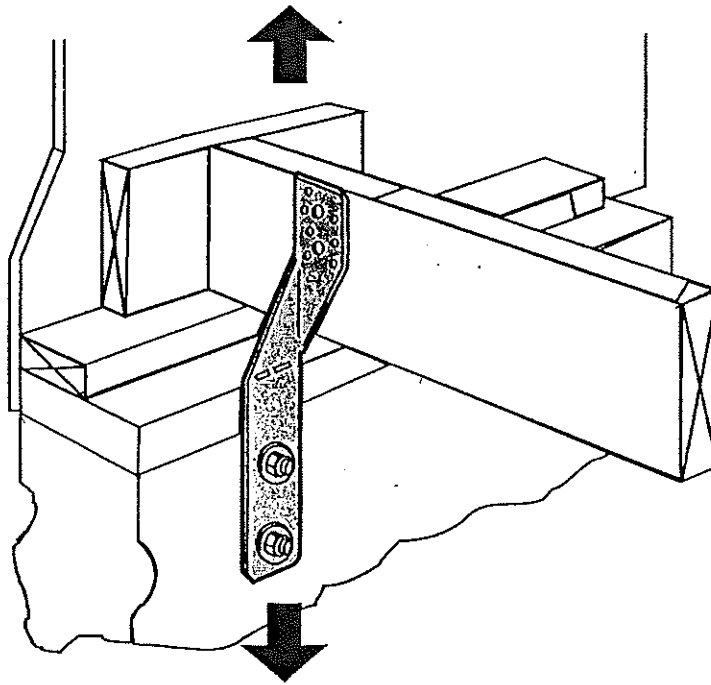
FLOOR JOIST TIE-DOWN FOR
